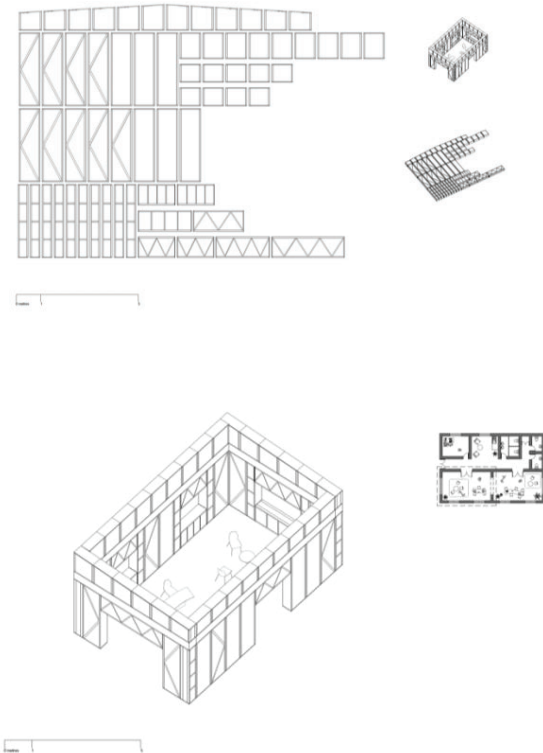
Modular school design featuring assembly and disassembly details for efficient construction, adaptability, and sustainable reuse.
